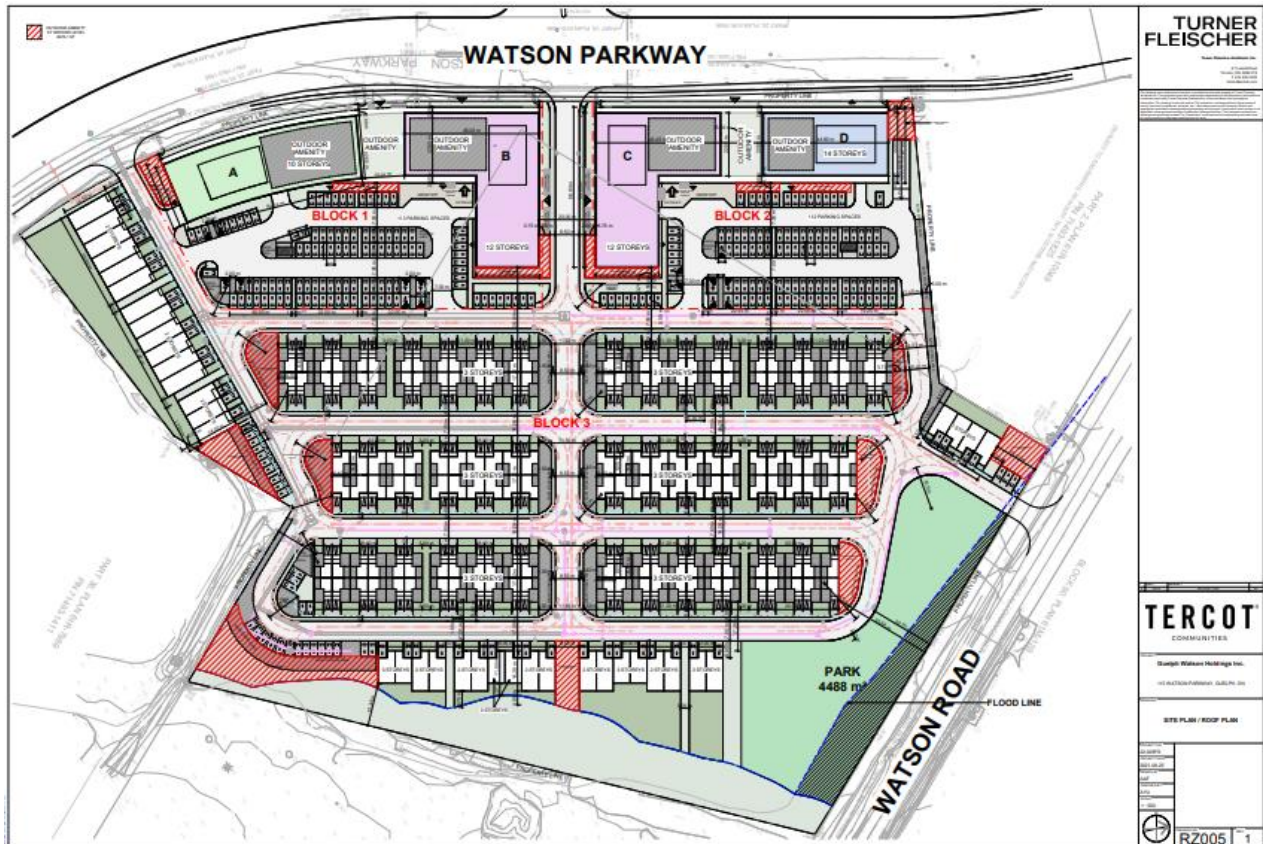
is an Excerpt from the Architectural Site Plan, prepared by Turner Fleischer Architects Inc. (TFAI) For detailed information regarding the layout of the proposed development, please refer to the latest drawings prepared by TFAI. For general existing site conditions see Appendix A.
